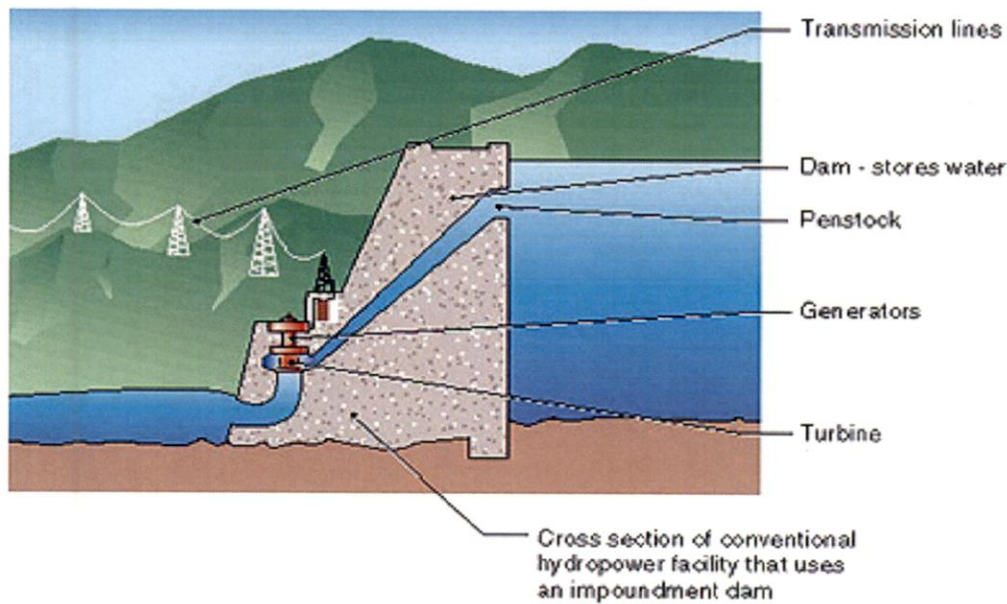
Typical arrangement of dam toe based scheme [6]
